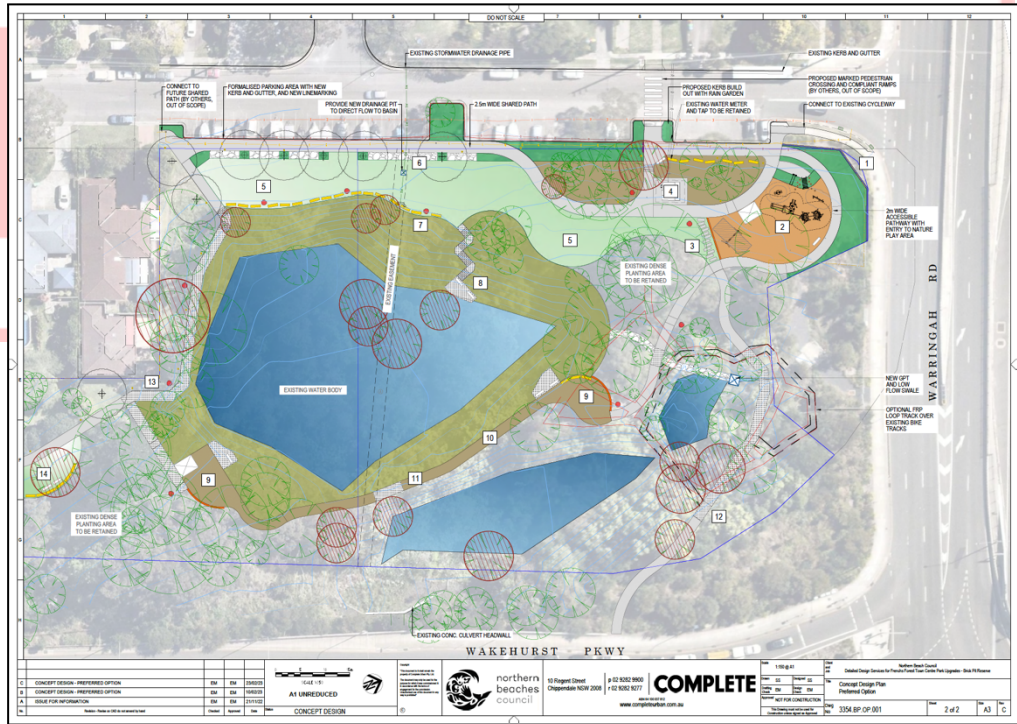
Sheet 2 of 2 showing the proposed concept design.
